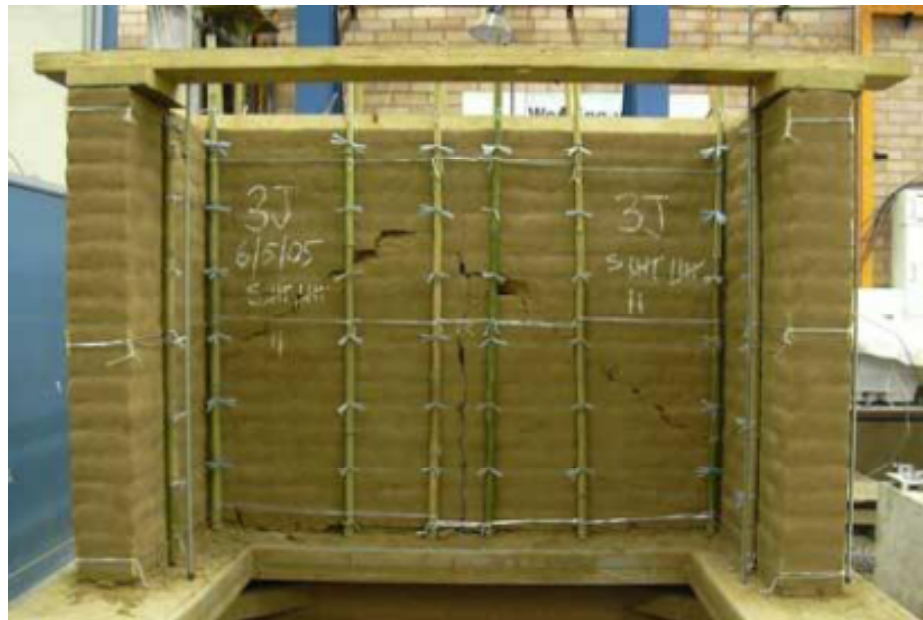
Externally Reinforced Bamboo Wall with Ring Beam (Redman and Smith, 2009)
